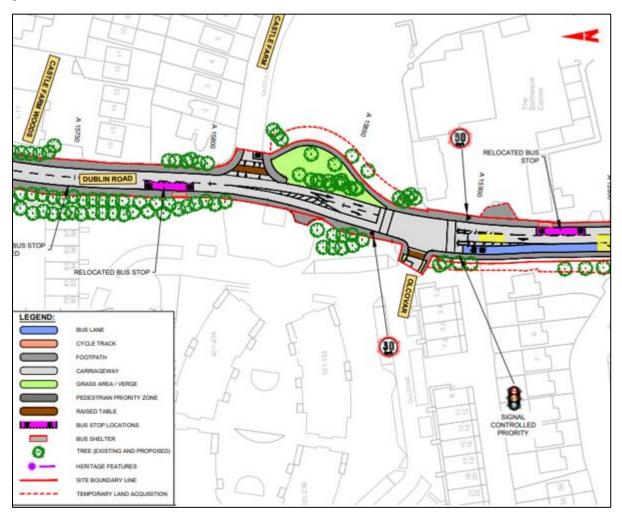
Extract from General Arrangement Drawing at Olcovar, Dublin Road (Sheet 45)
